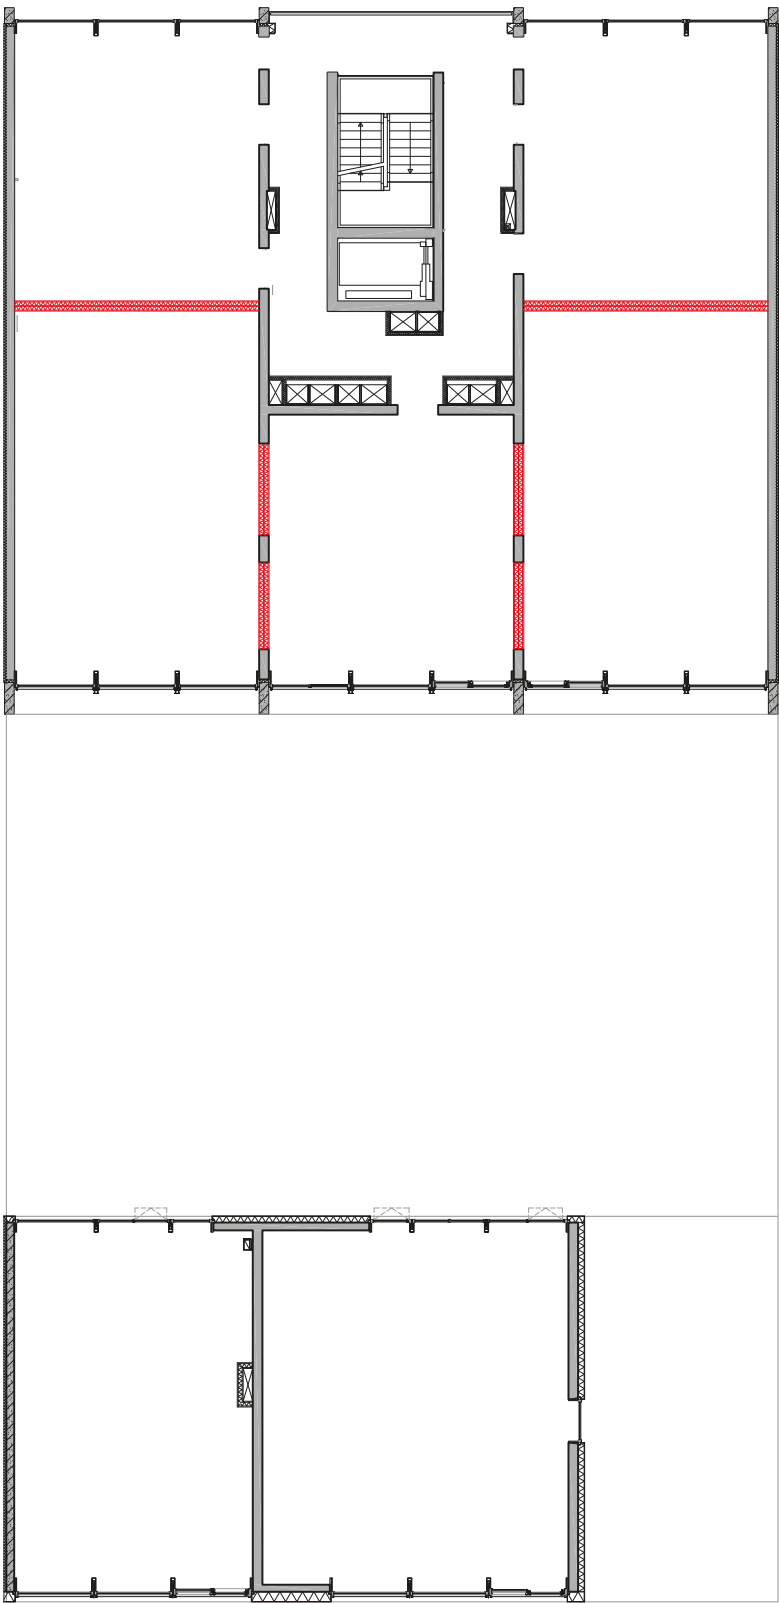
Floorplan with partition walls. (Source: Marc Koehler Architects, n.d.)
